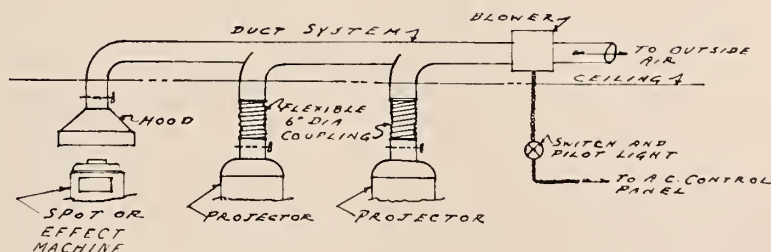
Equipment ventilation system: blower capacity 400 cu.-ft. per min.; minimum air movement through lamp houses with blower idle, 15 cu.-ft. per min.
